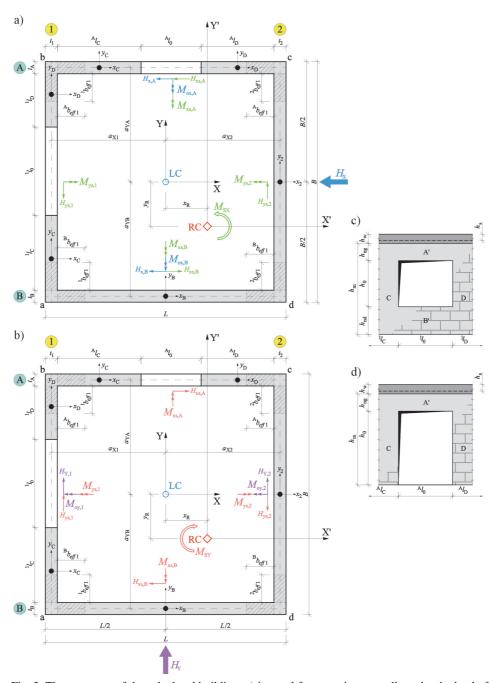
The geometry of the calculated building: a) internal forces acting on walls under the load of H_X , b) internal forces acting on walls under the load of H_Y , c) a fragment of a wall with a window opening in the axis 1, d) a fragment of a wall with a door opening in the axis A
